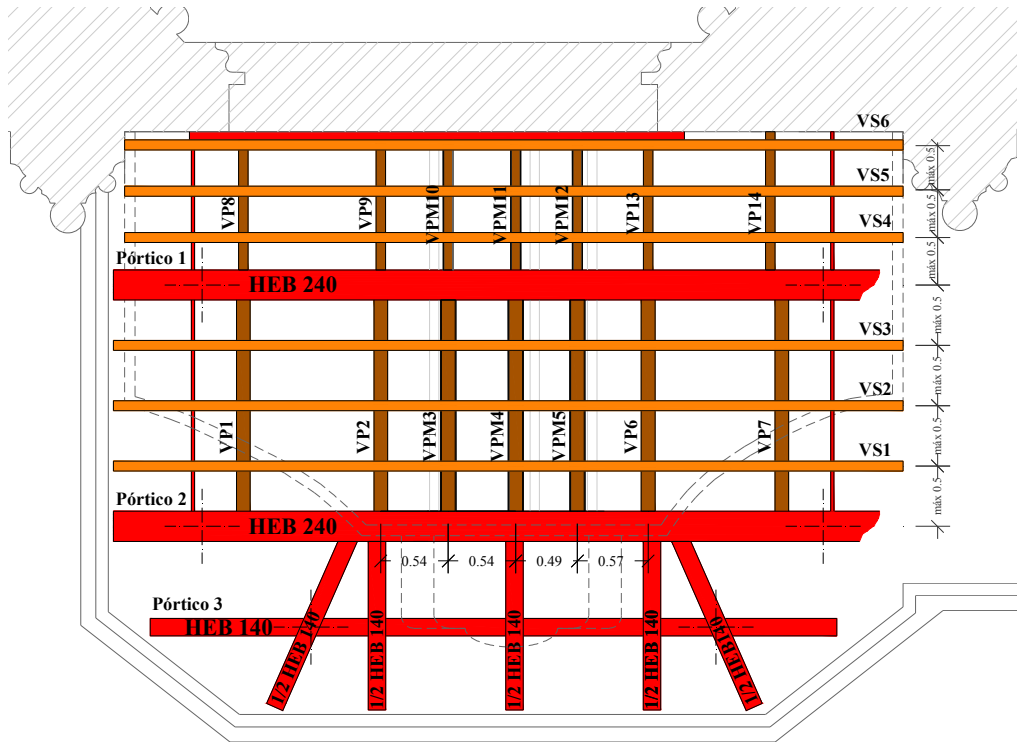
Dimensioned survey of a timber floor. VP, PM: main beams; VS: Secondary beam (dimensions in metres)
